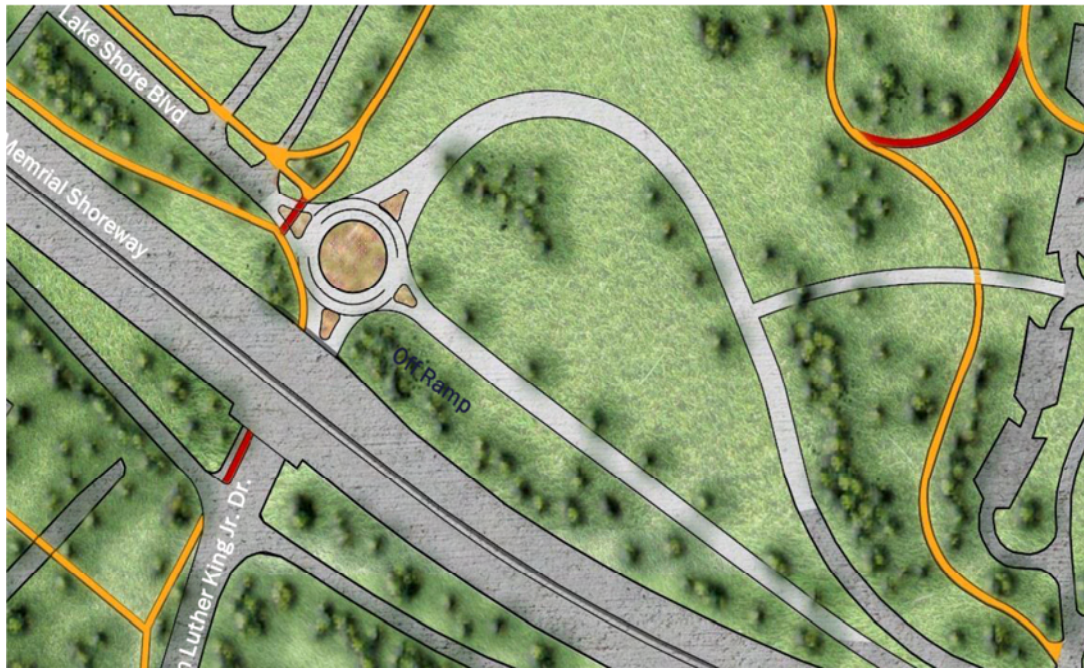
A: E.72ND STREET CONCEPT (LAKEFRONT GREENWAY)
